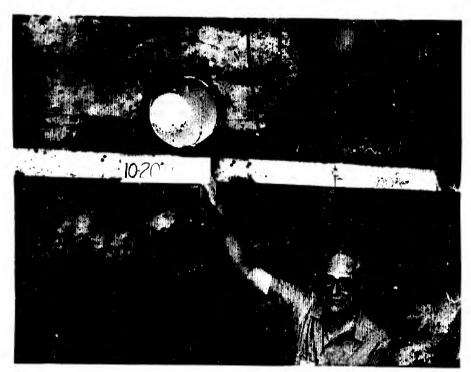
Crack Across Front Face of Upper Left Anchor Block
